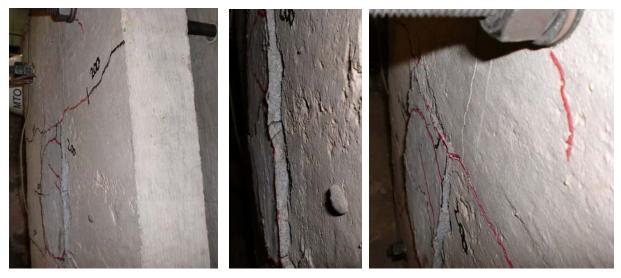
Views of the cracks and pop-out of the shear pocket of specimen PO-4B just before failure
